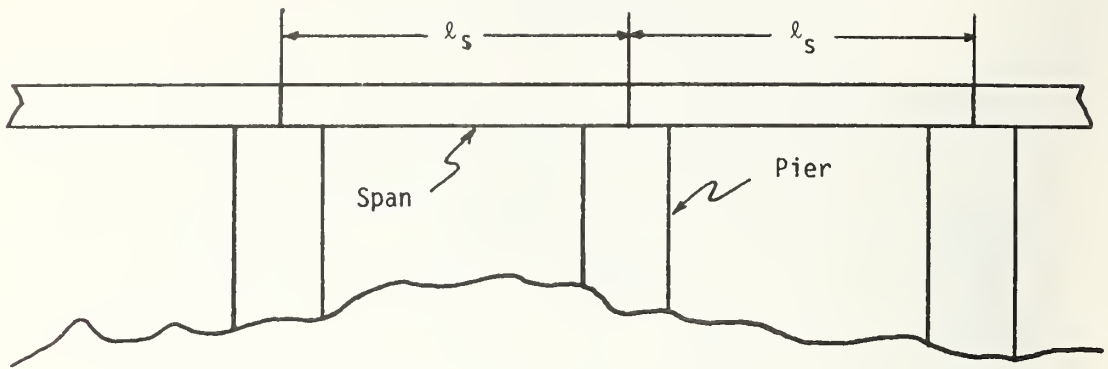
GENERAL ELEVATED GUIDEWAY CONFIGURATION
